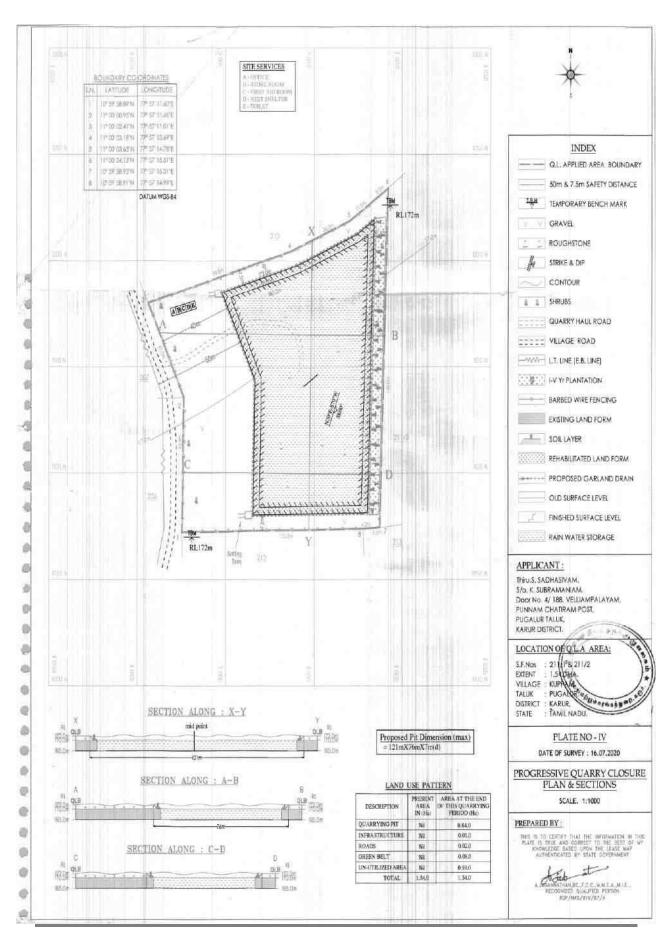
CLOSURE PLAN AND SECTIONS - PROPOSAL
